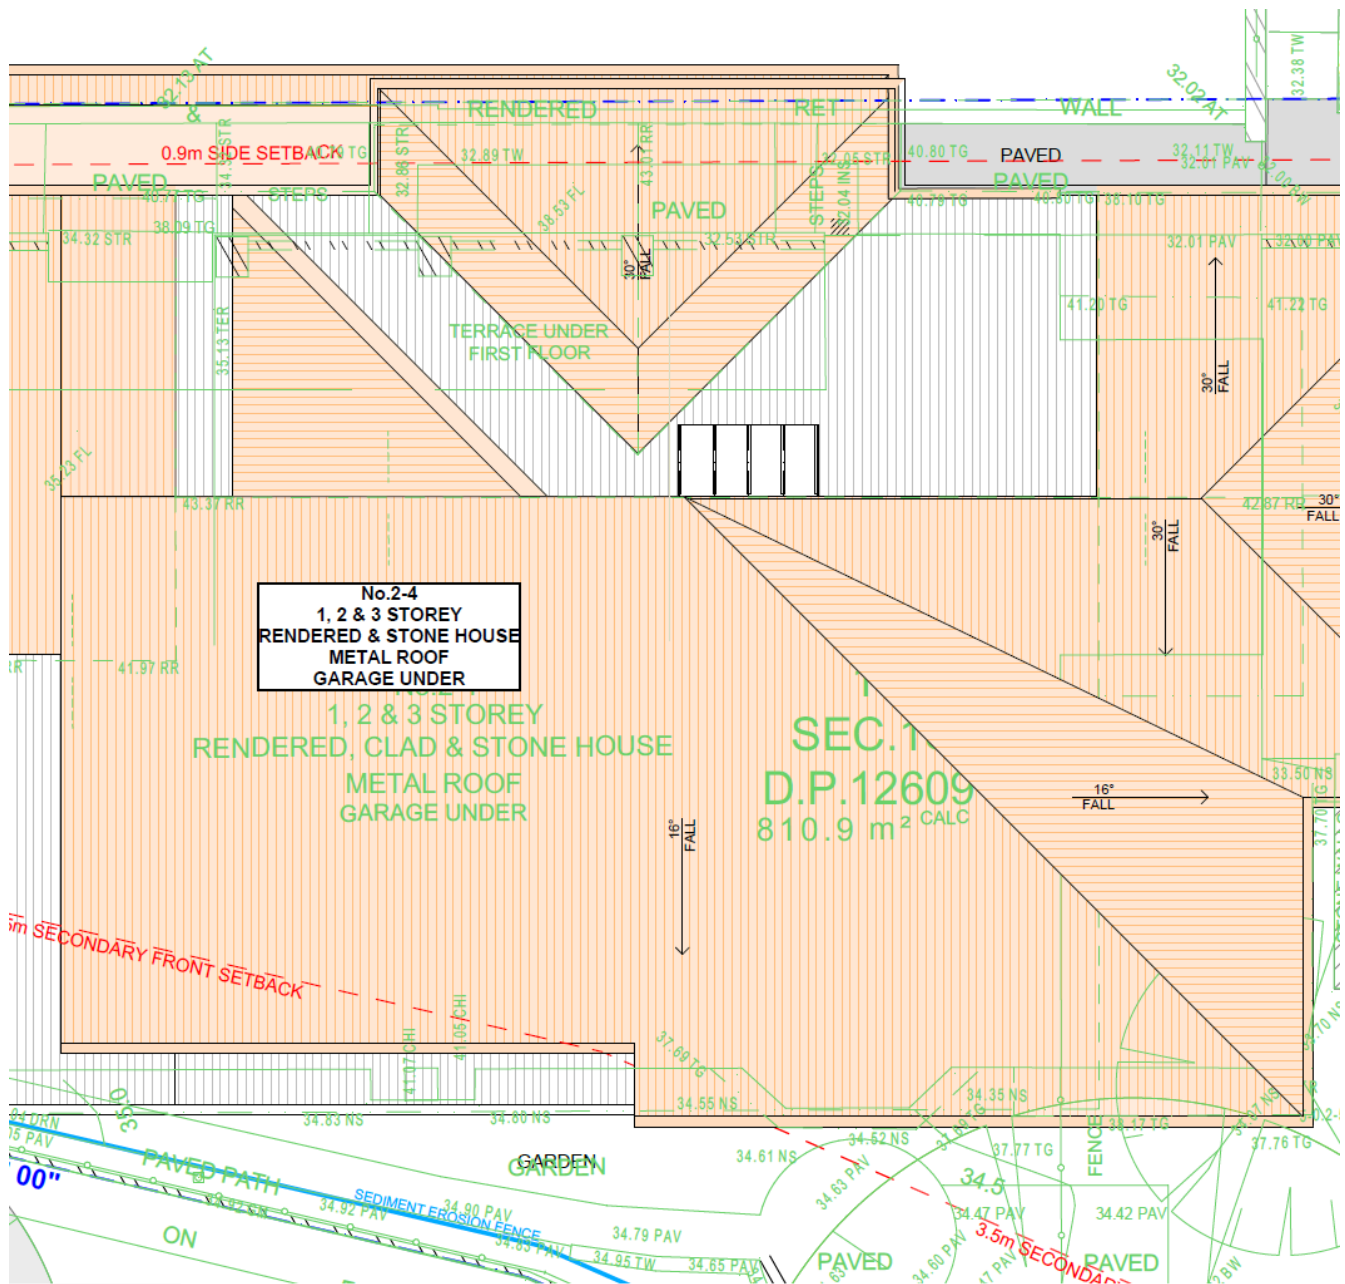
Site Plan with overlaid survey plan which shows topography of site sloping towards the north-east and below the first floor master bedroom
